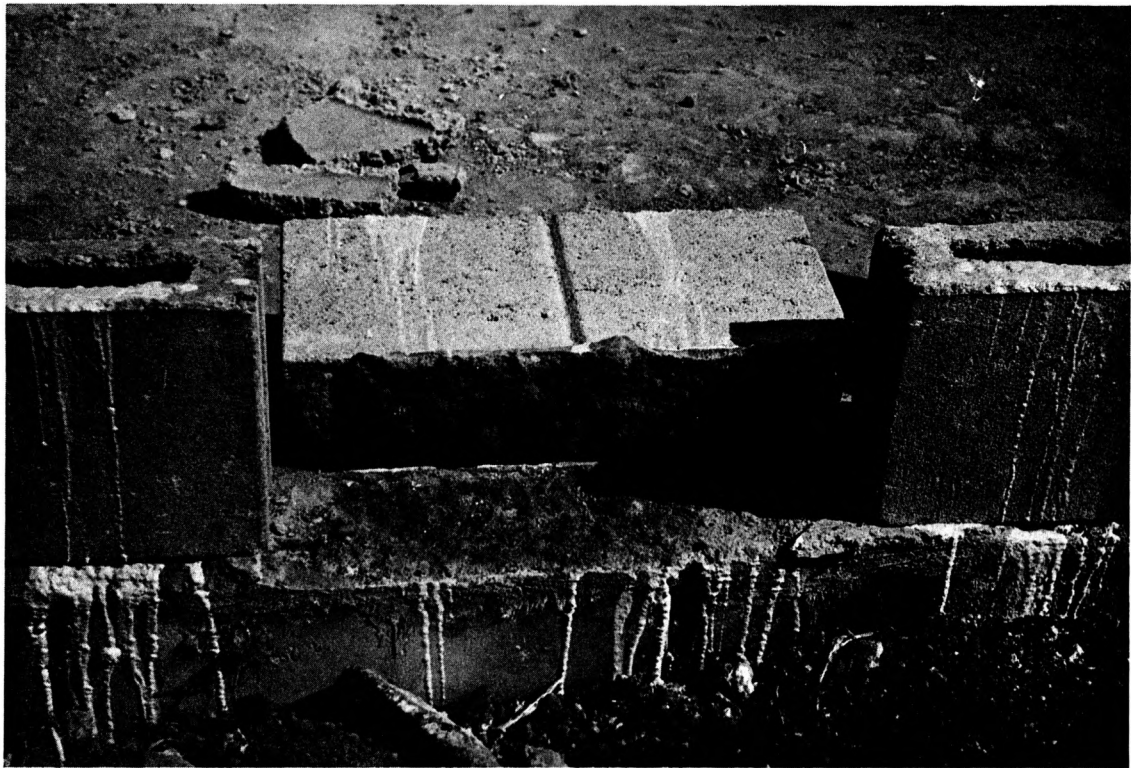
Bond of Block to Concrete Slab is Greater Than Tensile Strength of Slab
